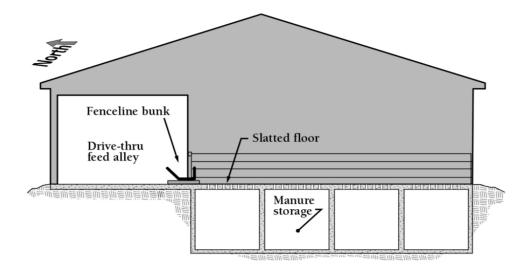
Slatted floor confinement (Euken et al. ,2015).
